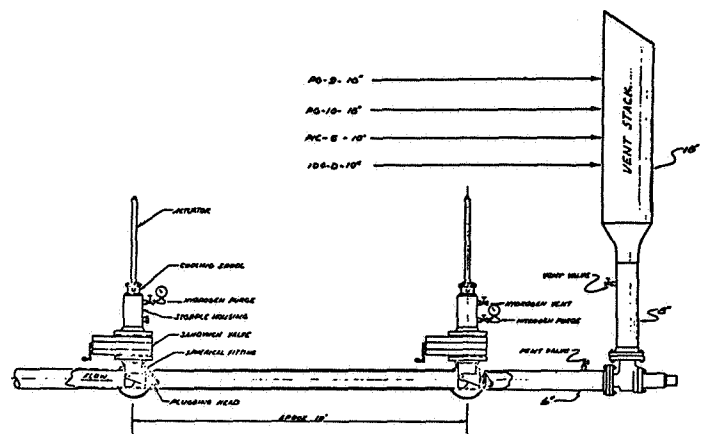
Six inch process gas stopple job (638°F at 410 lb./sq. in. gauge.) Illustration courtesy TDW Services, Inc.
